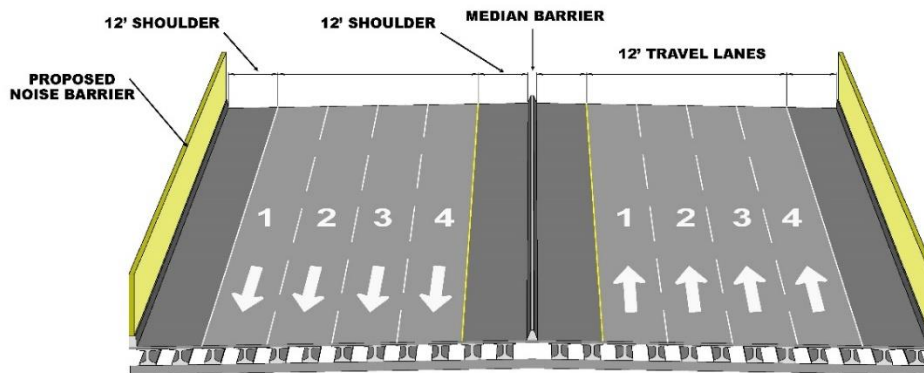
I-10 MAINLINE TYPICAL SECTIONS
